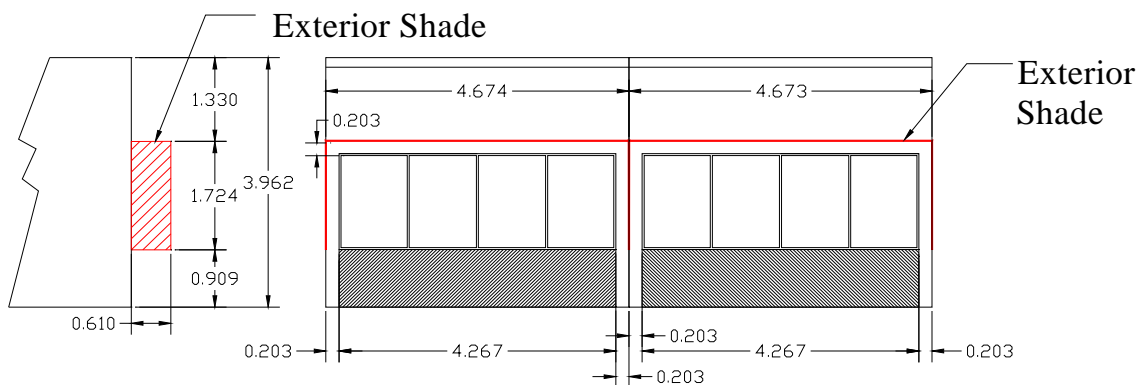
Drawing and dimensions in meters of the exterior fins for west test rooms.
